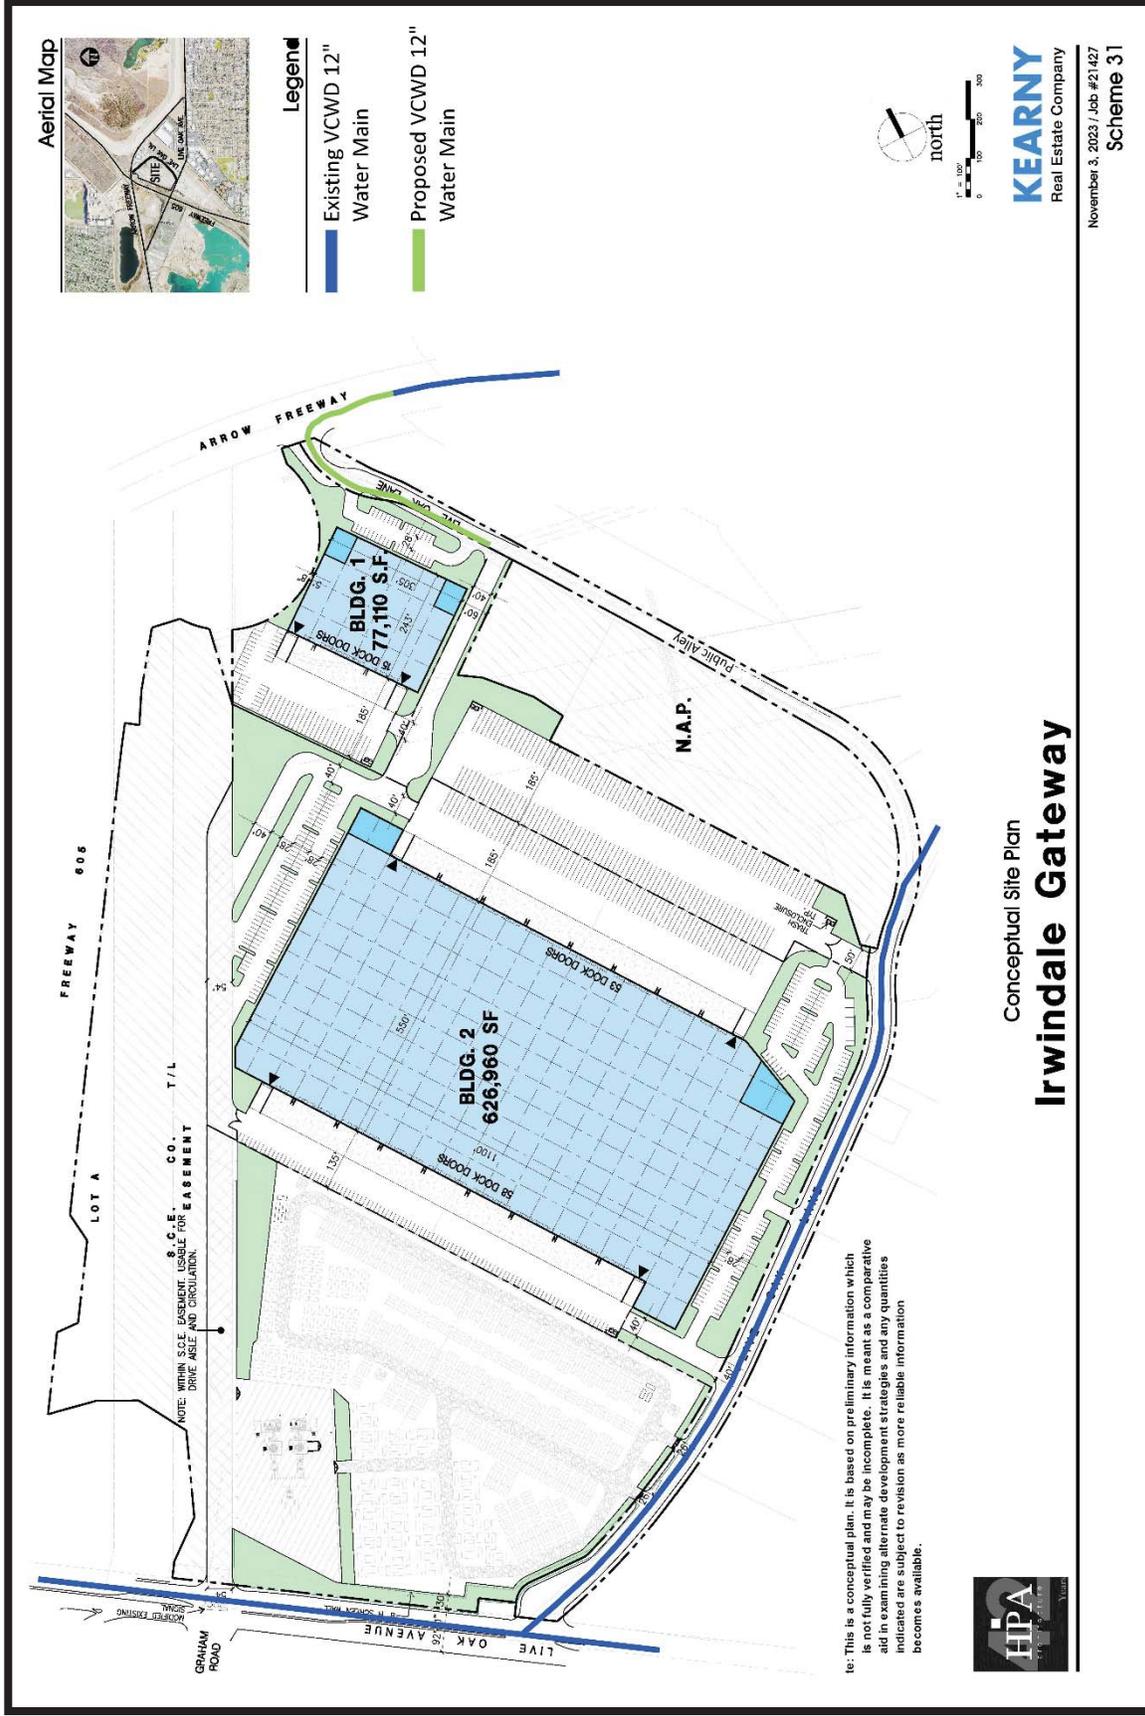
CONCEPTUAL WATER PLAN WITH BESS
